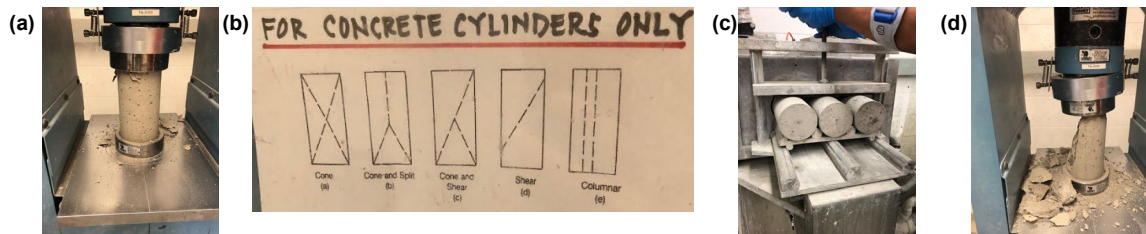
Auxiliary grout cylinder testing (a) setup, (b) possible cylinder failure modes, (c) cylinder end grinding, (d) cylinder shear failure
